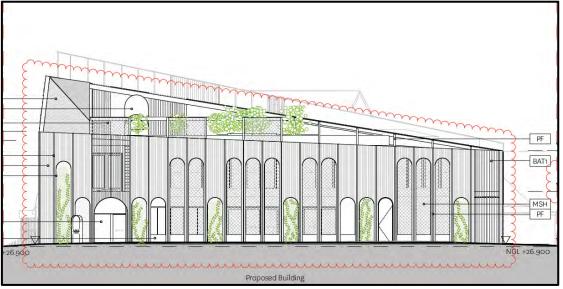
Excerpt from Drawing No.TP03.1 Streetscape Elevations (Proposed)
